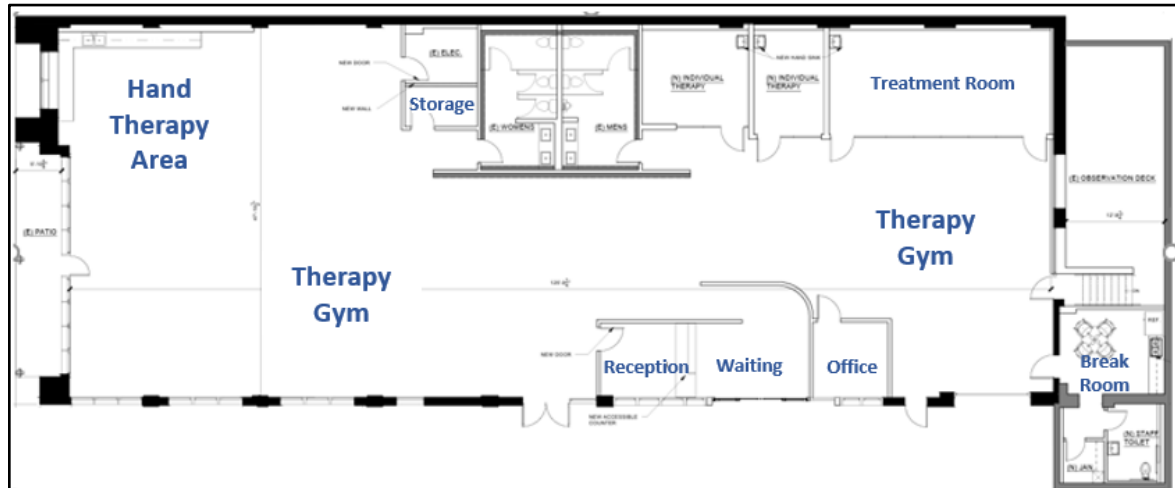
The site plan proposes to repurpose the existing parking lot for a new outpatient physical therapy center.
